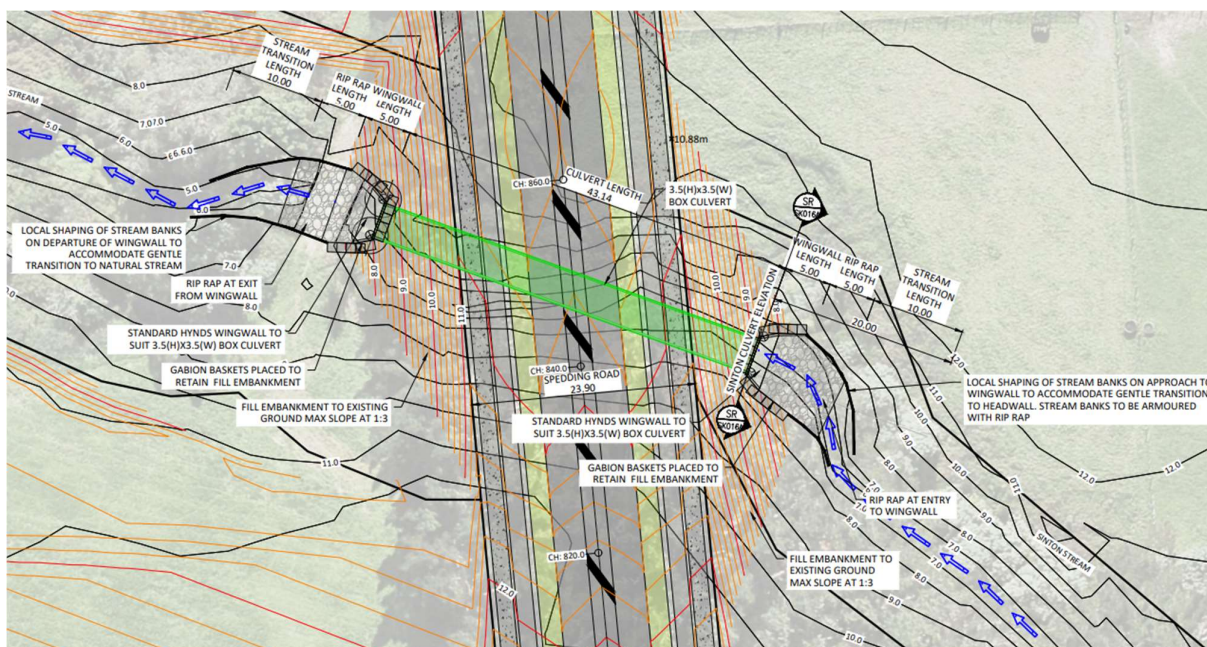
Sinton Stream Culvert (snip from Drawing SK016, Crang Civil Consulting Engineers, provided in Appendix A)
